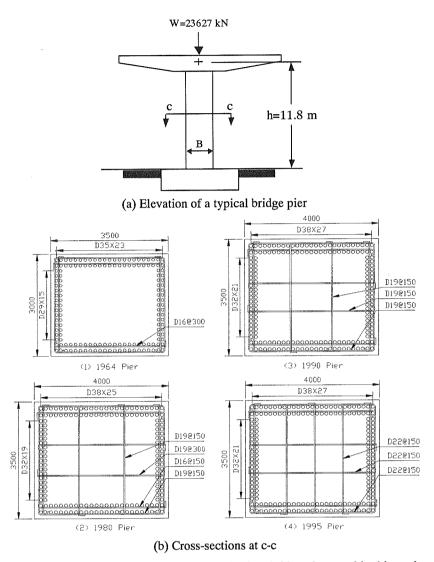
Elevation and sectional views for the four bridge piers used in this study.
